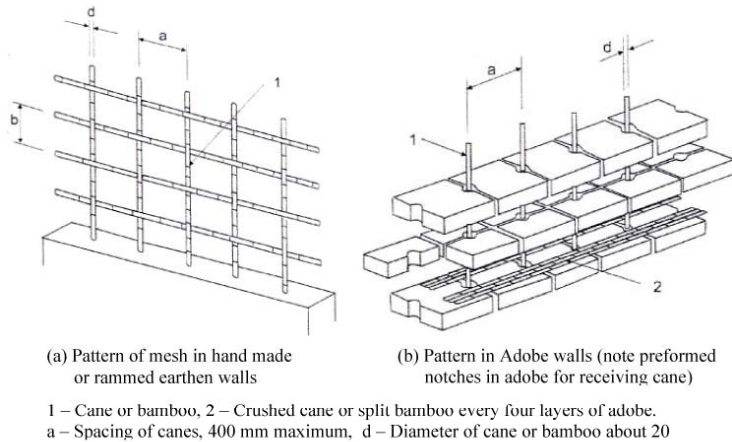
Best earthquake reinforcing arrangement for earthen walls
